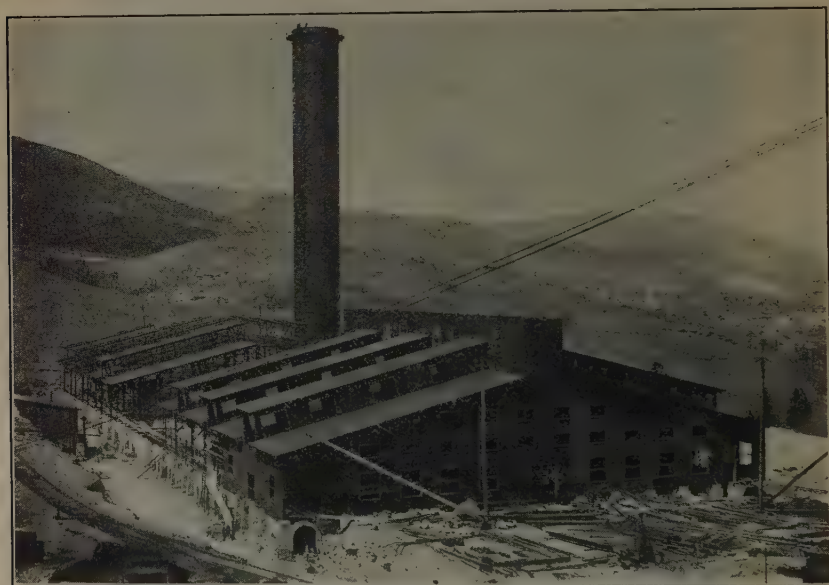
REVERBERATORY FURNACE PLANT UNDER CONSTRUCTION AT NEW WORKS, ANACONDA, JUNE, 1901.
